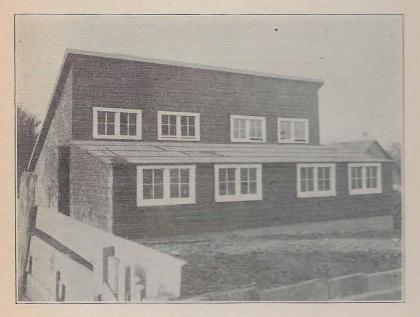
South facing, half-monitor house showing poor placing of upper windows.
